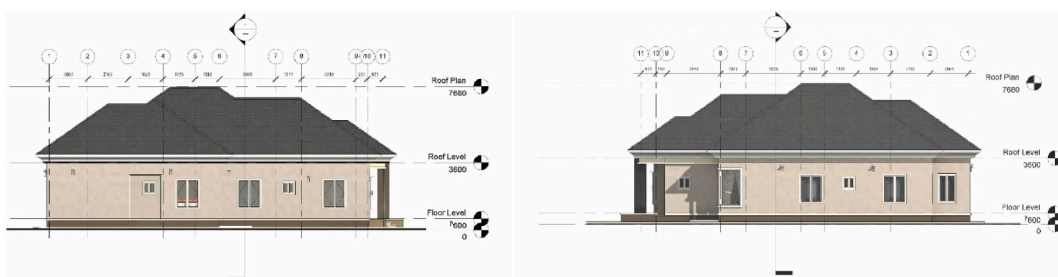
A West and East Elevation view of the Proposed 3-Bedroom Bungalow.
